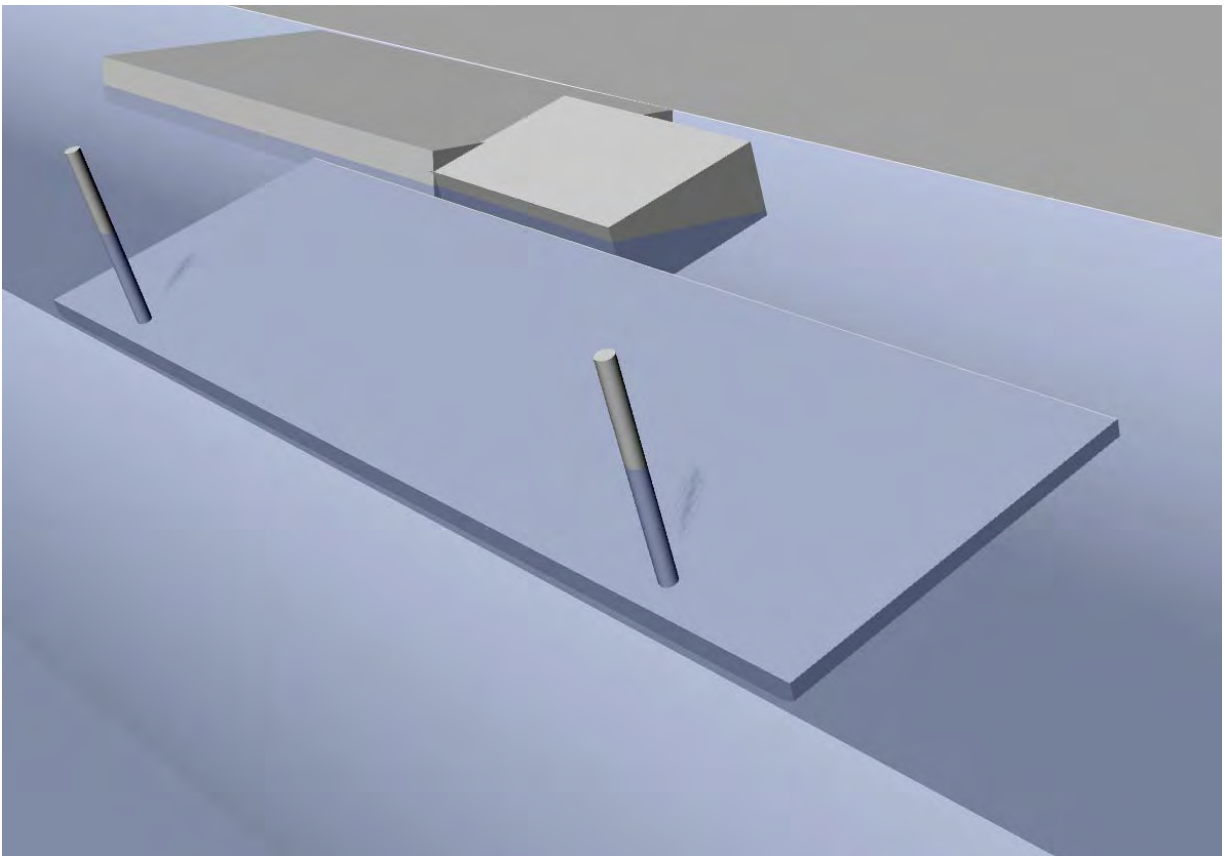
Rendering Sketch of Barge Orientation with Transparent Waterline at MLLW
